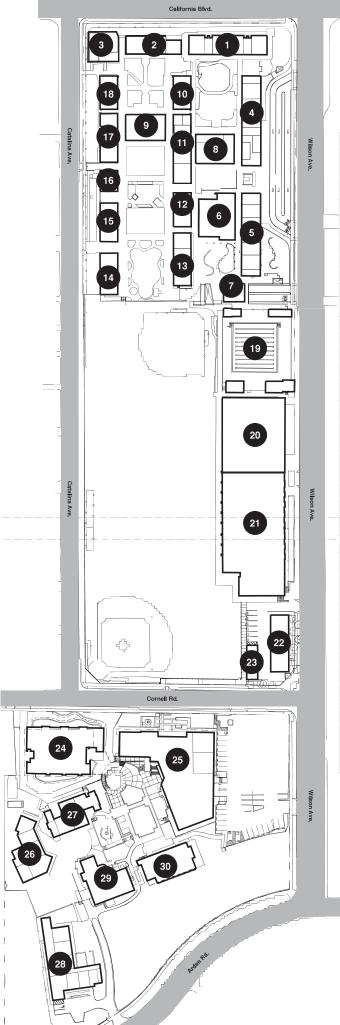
Existing Buildings Polytechnic School 2017 Master Development Plan
